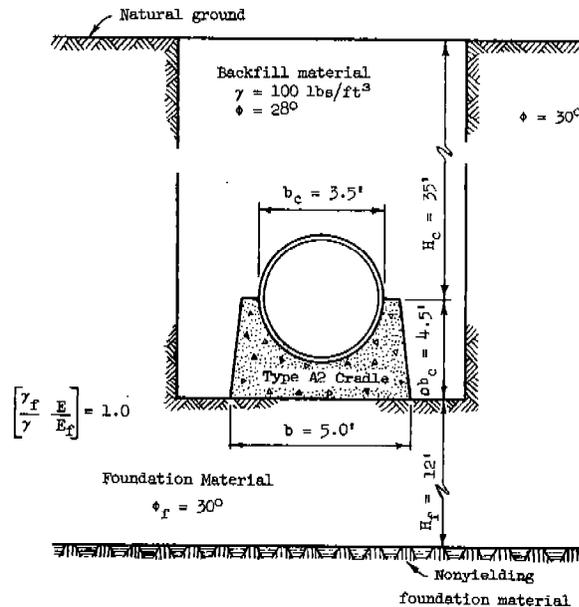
Procedure for determining the safe supporting strength of a conduit installed as a ditch conduit or a positive projecting conduit.
